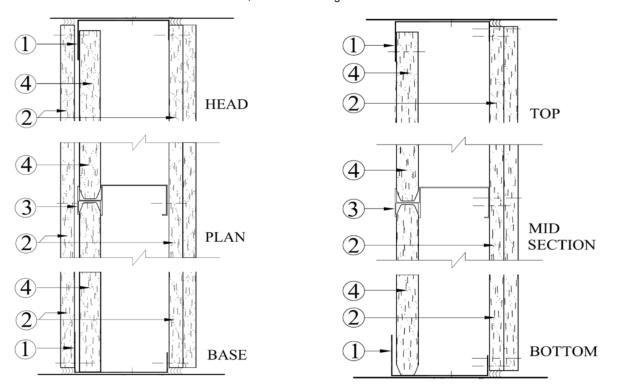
Three Hour Cavity Stair Wall (Non-Load Bearing)
